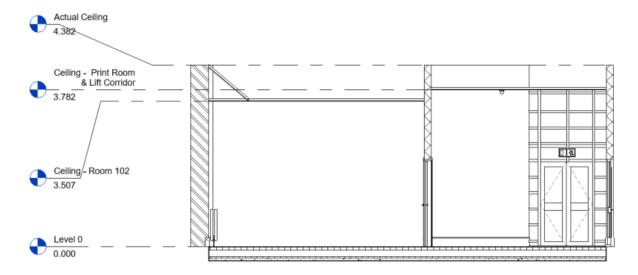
Cross section of ceilings from the Room 102 B to Print Room
